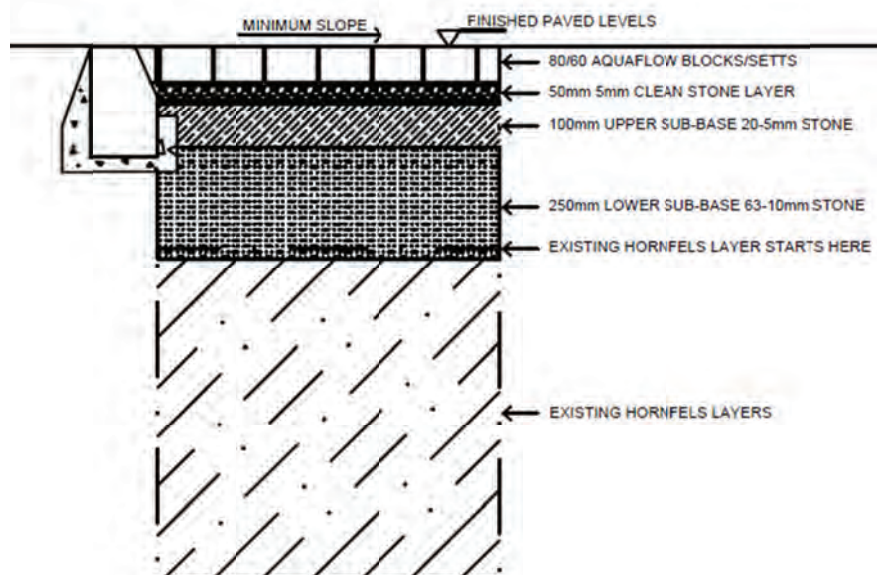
A Typical cross section of the permeable paving area (Iliso Consulting Engineers, 2009)
